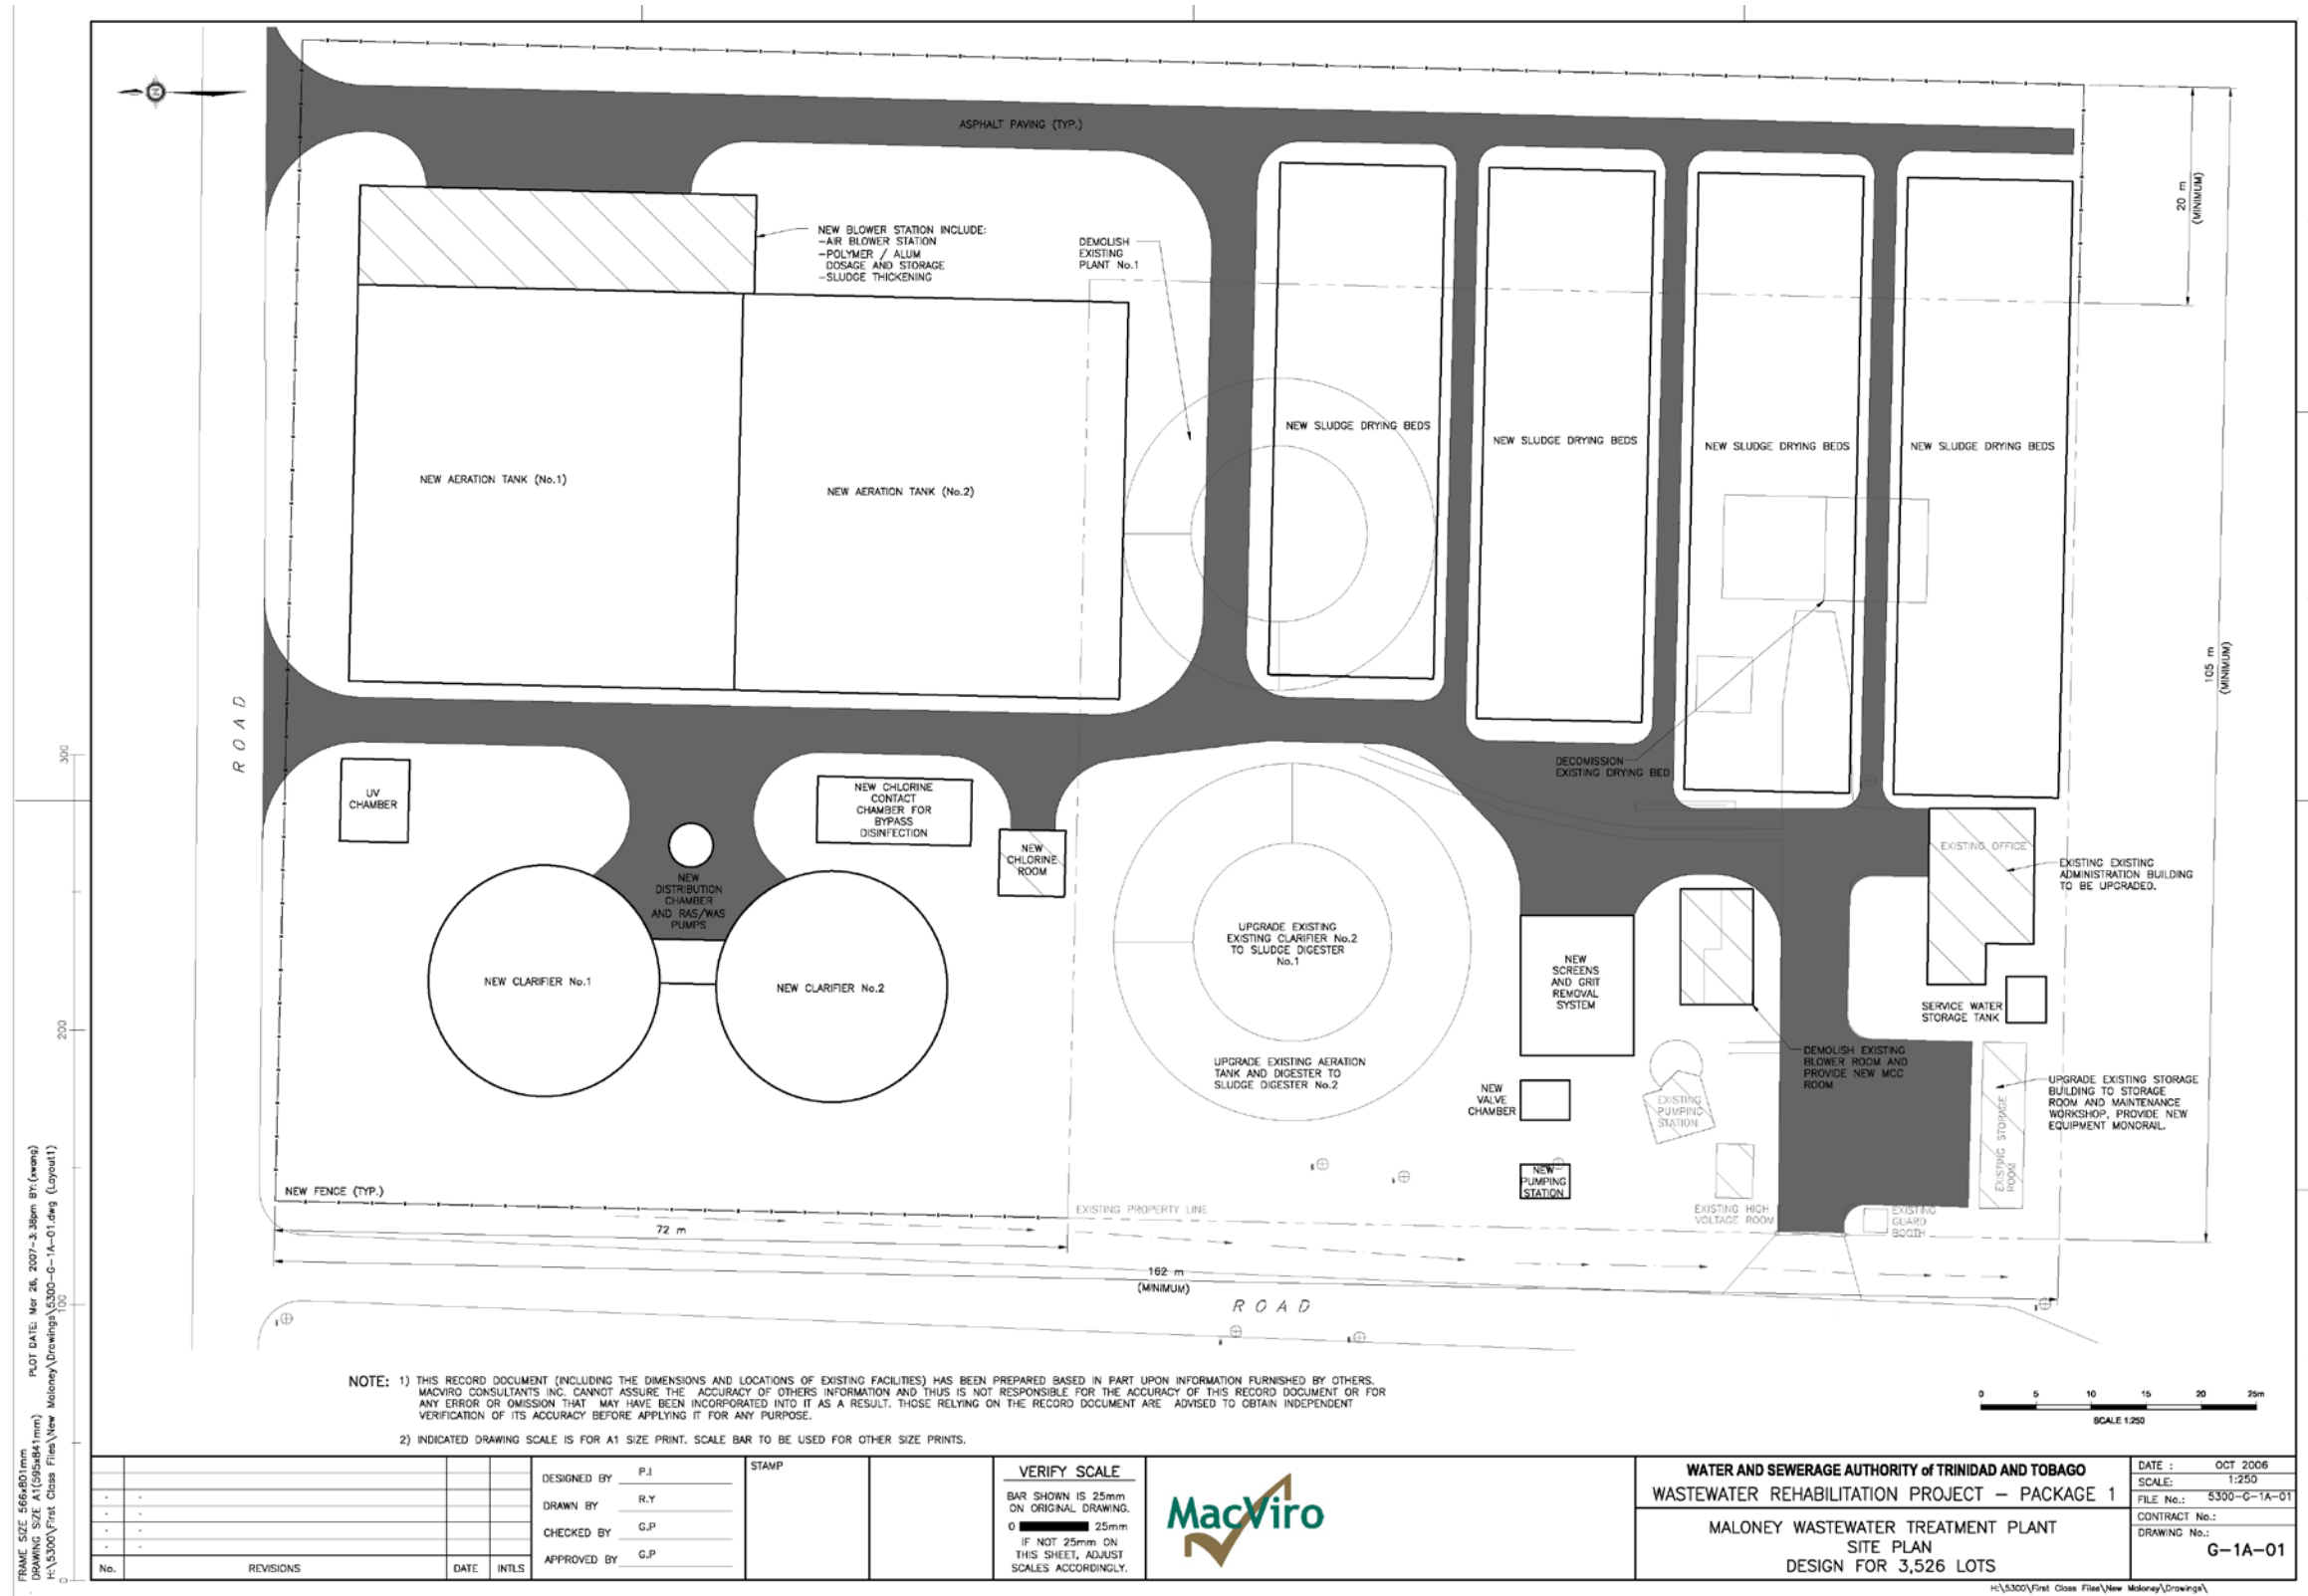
Site Plan of the New Maloney Wastewater Treatment Plant
